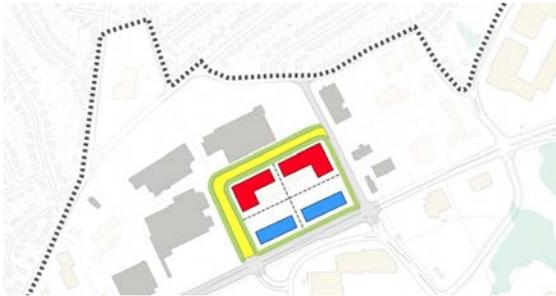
Potential Phase 1 redevelopment of parcel with new east-west street connecting to north-south street.
